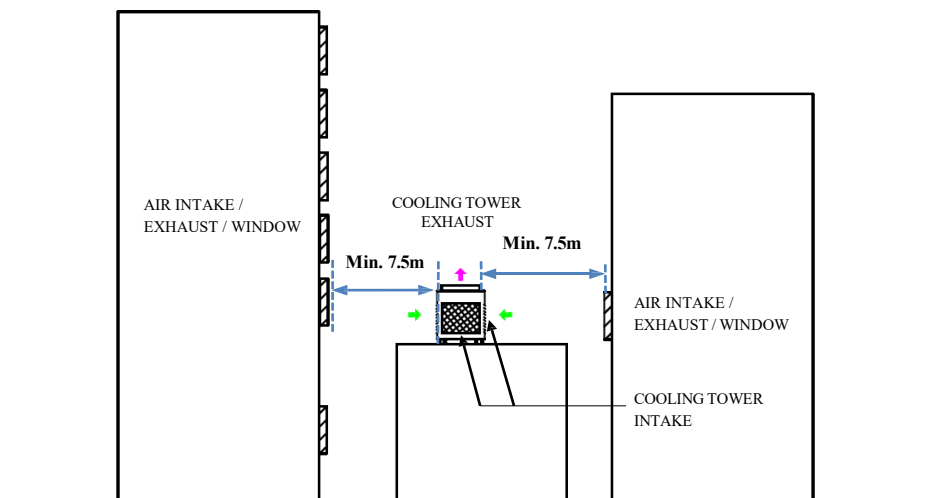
Cooling tower on roof surrounded by other buildings with minimum 7.5m horizontal separation from surrounding air intakes and exhausts, operable windows and public access.
